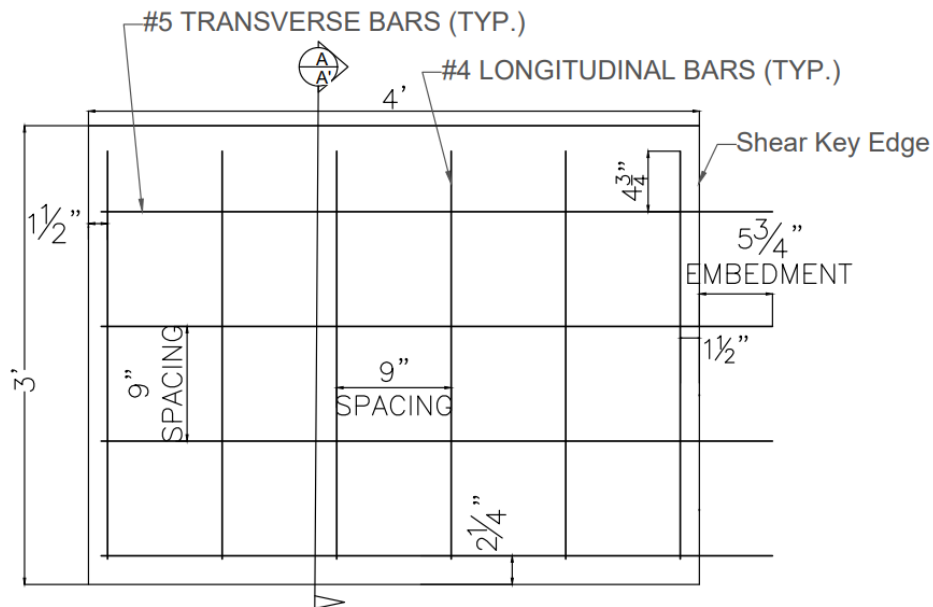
Precast Panel Detail for Closure Joint Specimens
